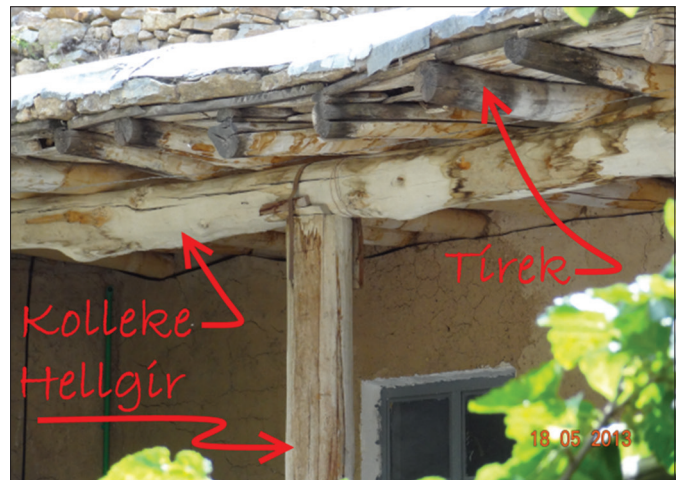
View of the extended flat roof structure at the visited house in the town of Tewelle. (Author, 2014)
